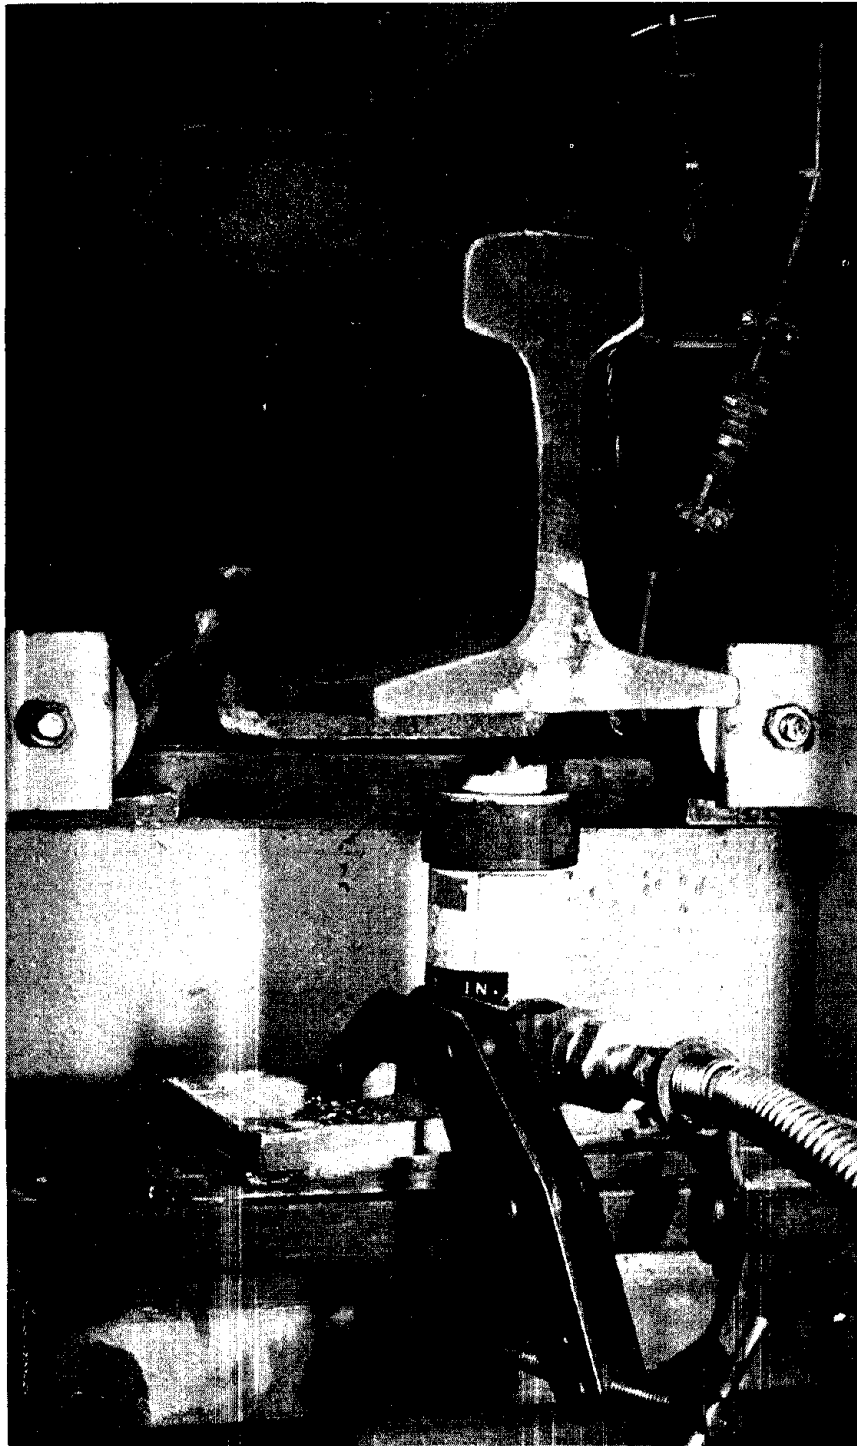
Test Set-Up for Fastener Resistance Test on Wood Ties About the Lateral Axis, Showing Load Application Arrangement and Instrumentation.
